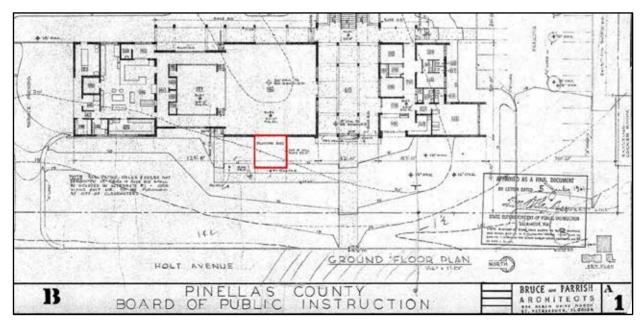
Bruce and Parrish Architects 1961 plans (detail), showing planting bed (indicated in red).
